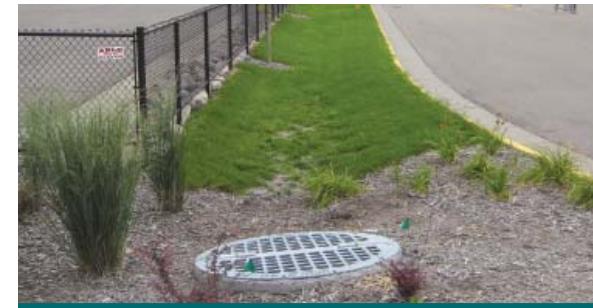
A long island separating an entranceway and parking lot is used to treat runoff with a bioswale.
